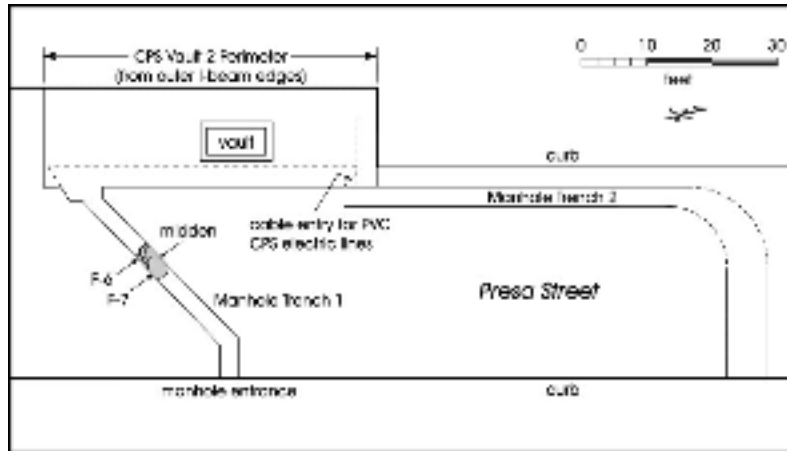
Vault 2 and backhoe trenches connecting the vault to nearby manholes.
